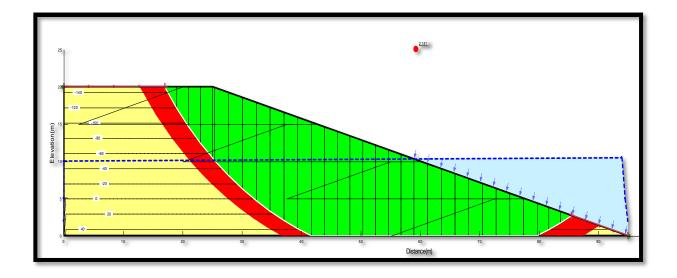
Embankment cross section for 1:3.5 slope at 10 m water level
